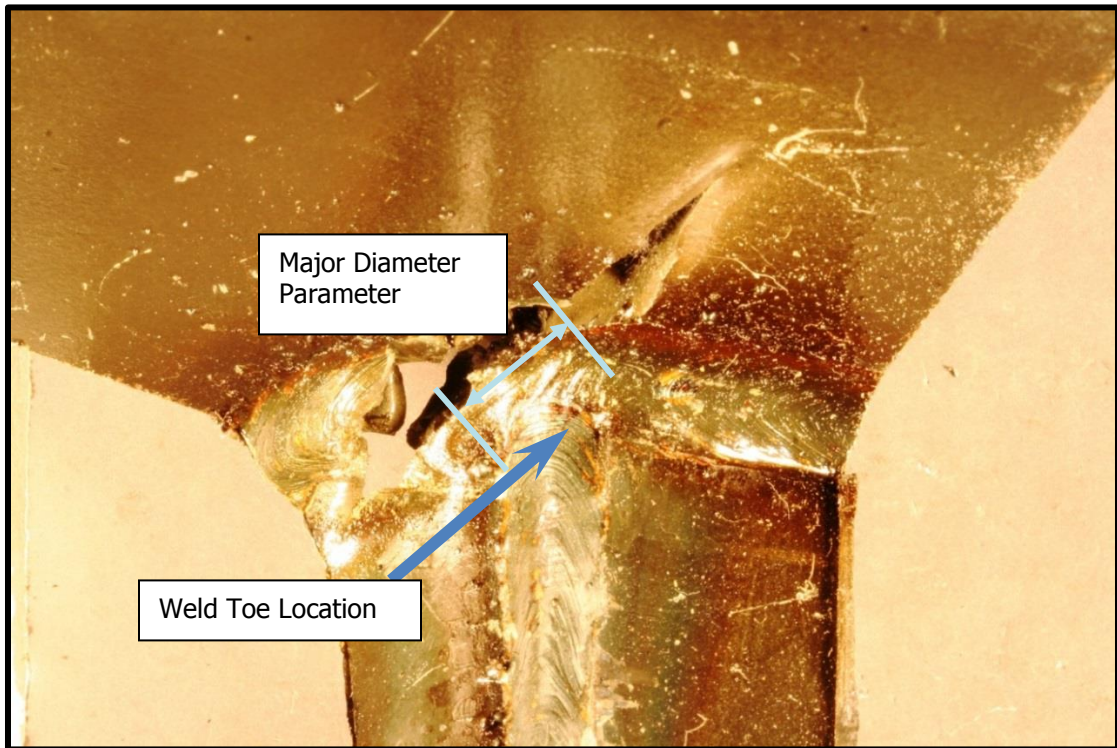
Specimen 6 with the top weld toe crack initiation point at Location B.
